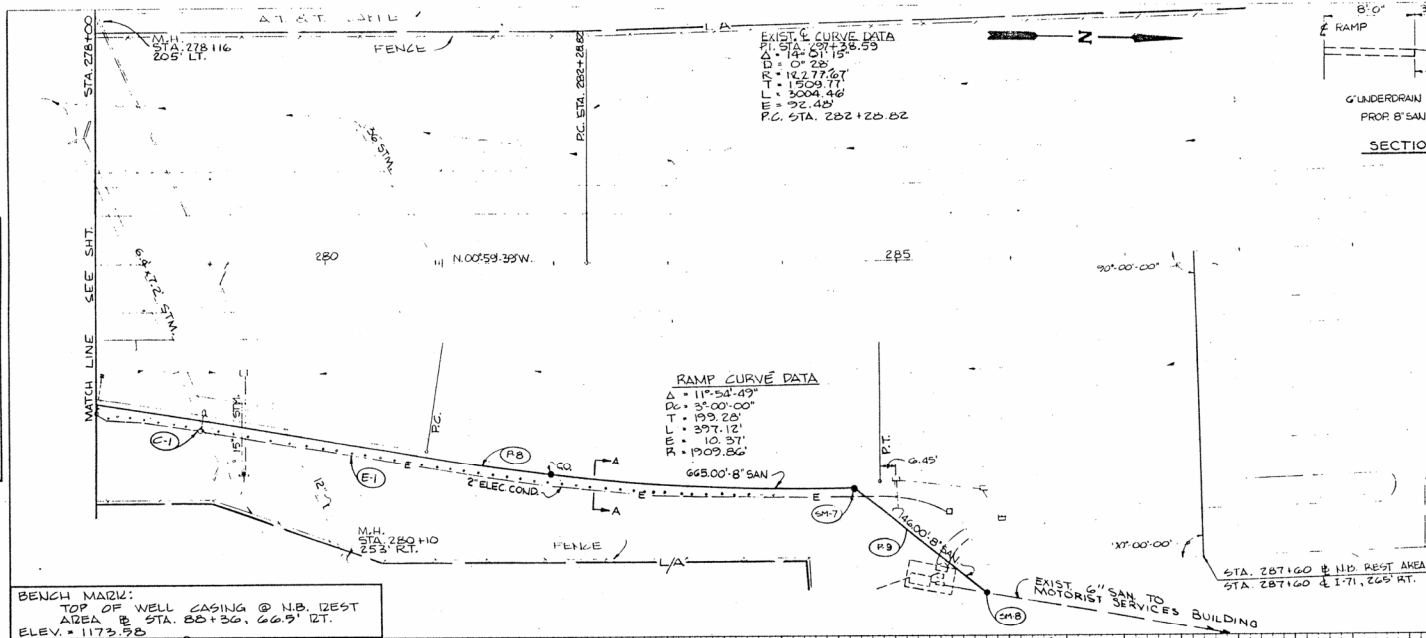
SINGLE PLAN AND CROSS SECTION FULL LINE
